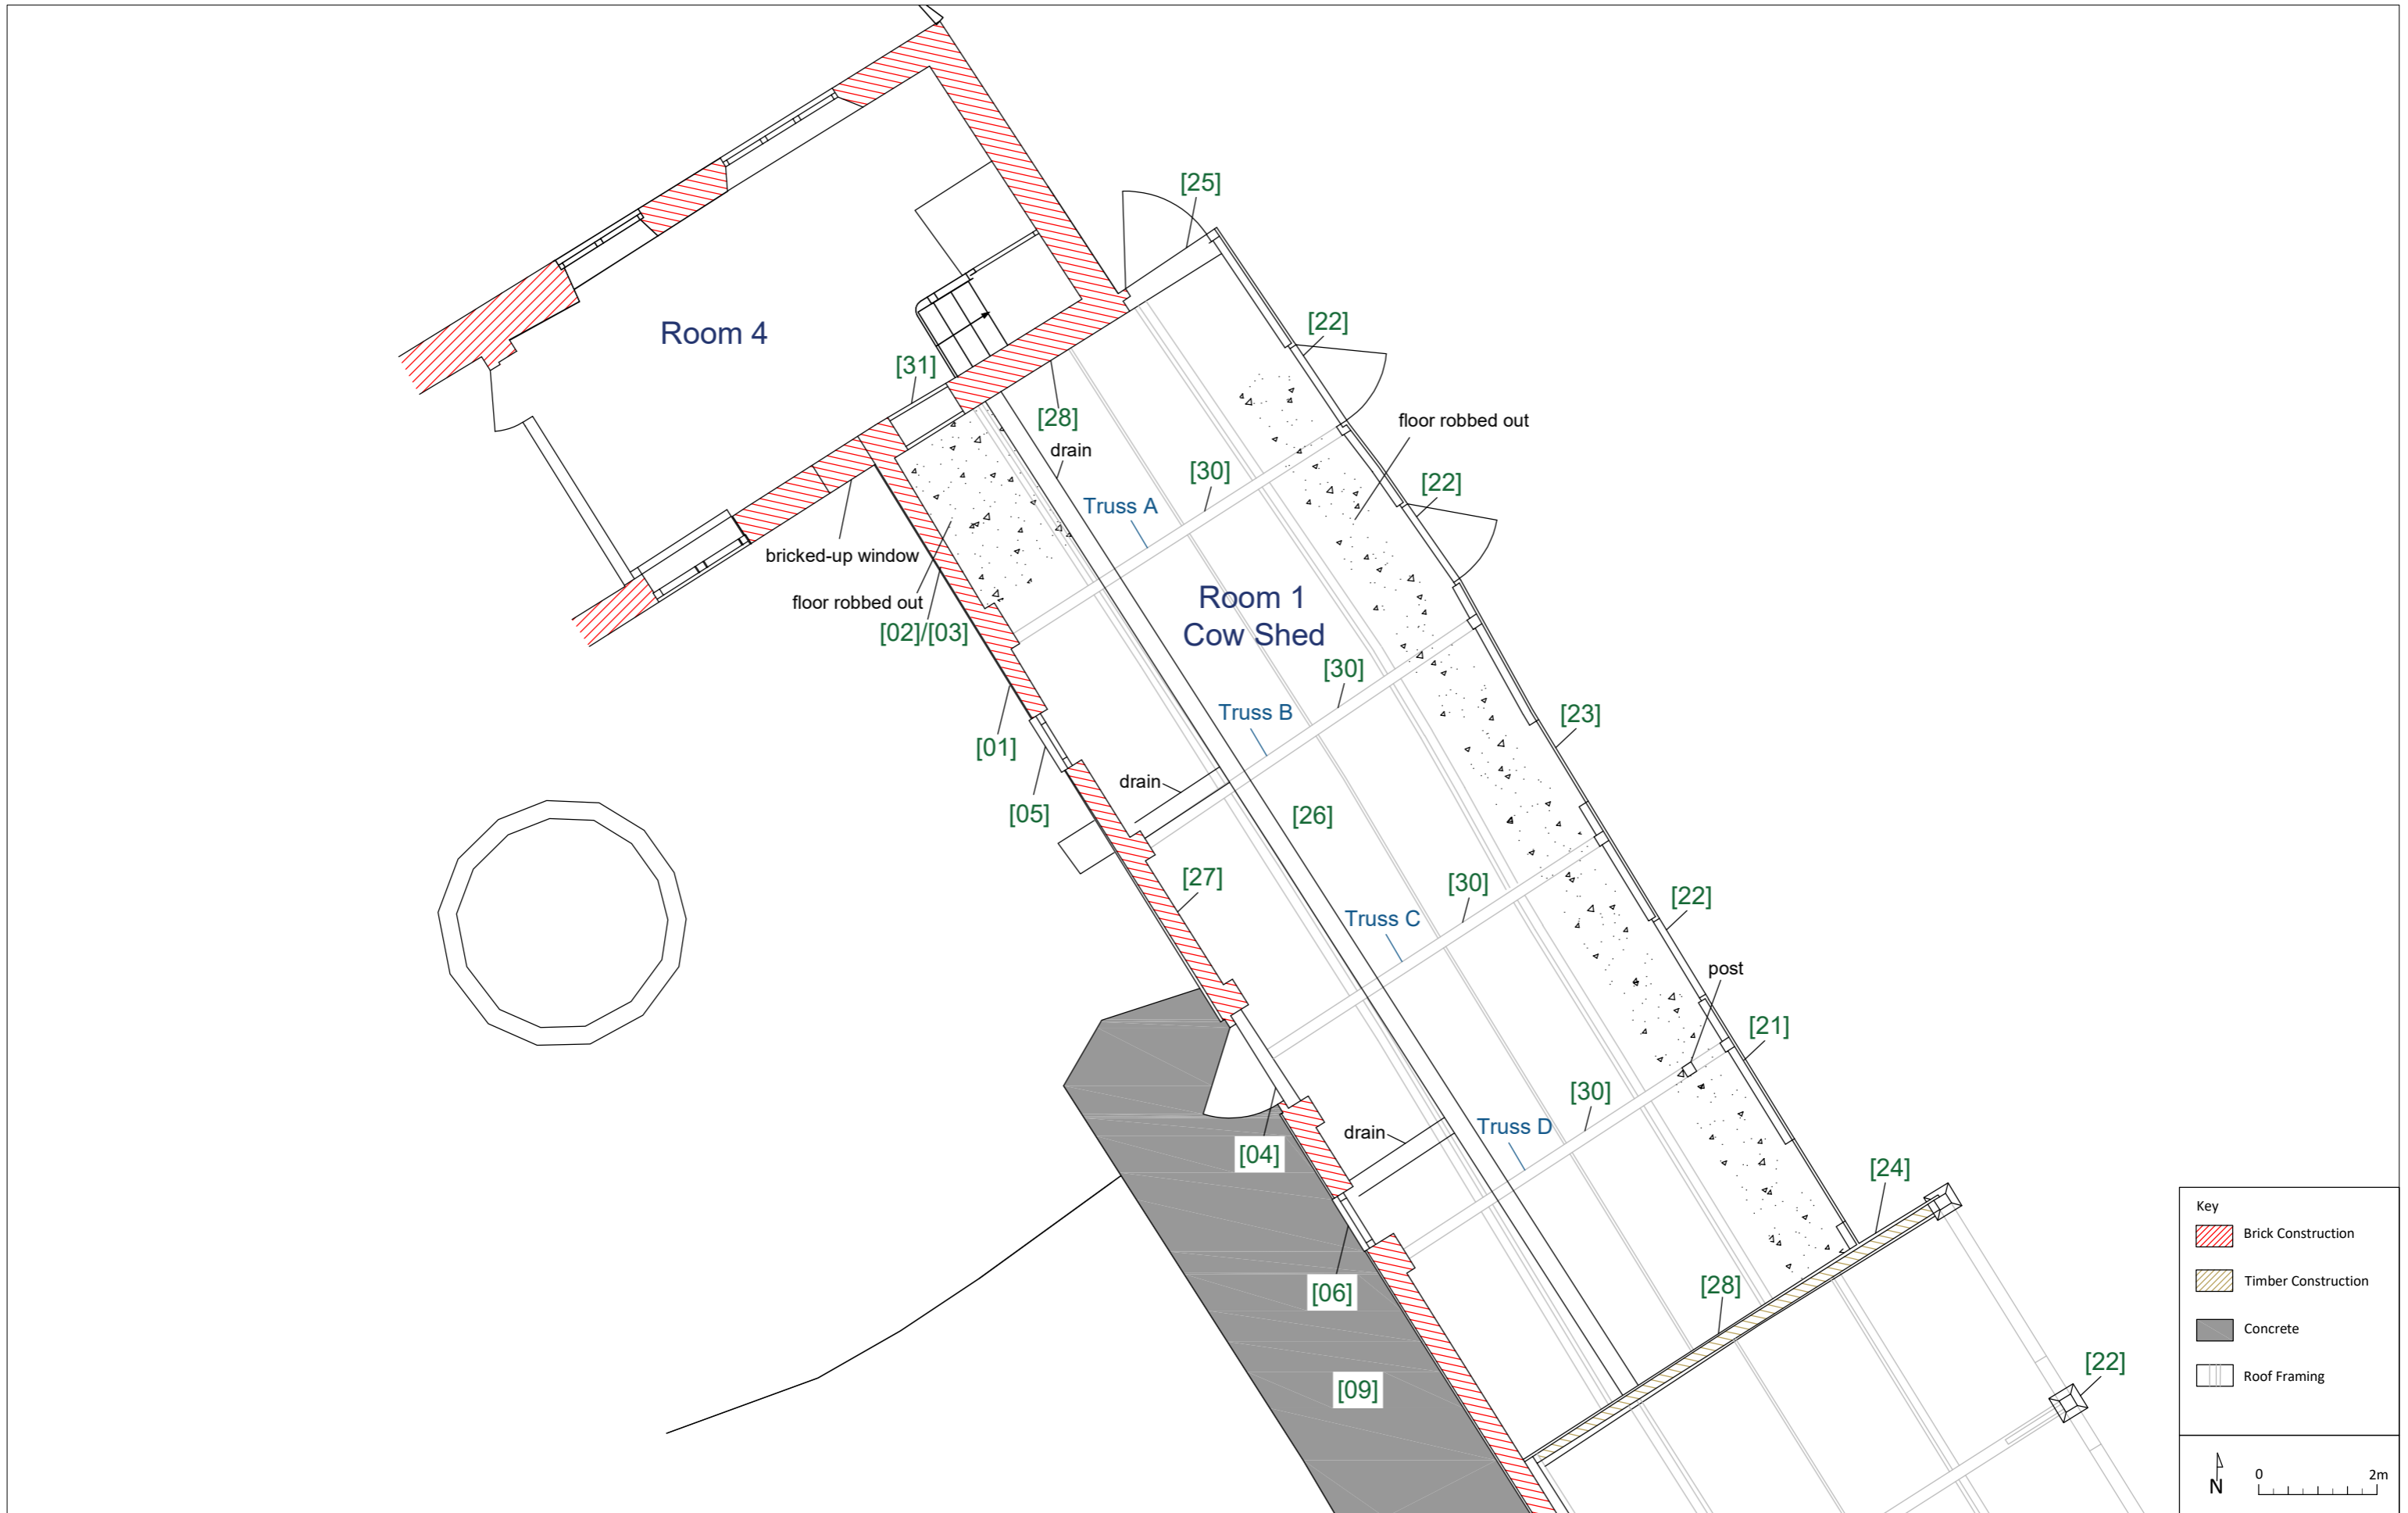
Old Arngrove Farm, Cow Shed & Cart Store, Ground Floor Plan (Rooms 1 & 4)
